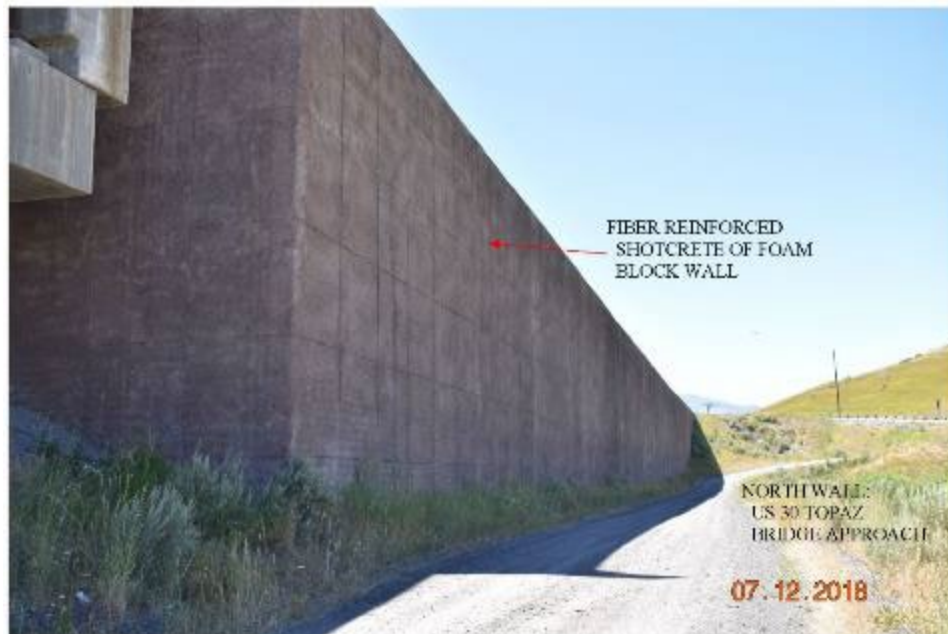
sUAV Survey of 30-ft High North Wall of Topaz Bridge Approach
